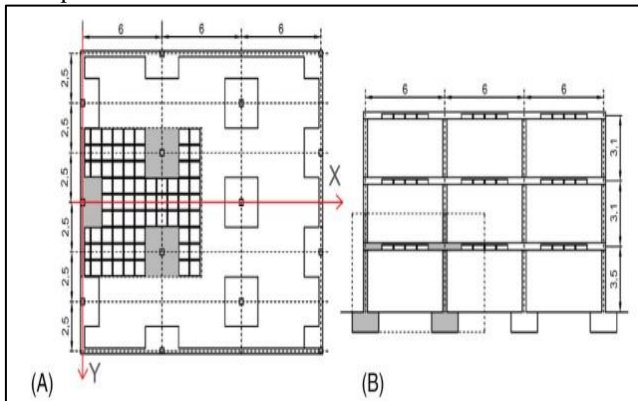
Prototype RC structure: (A) plan; (B) elevation (dimensions in m)
